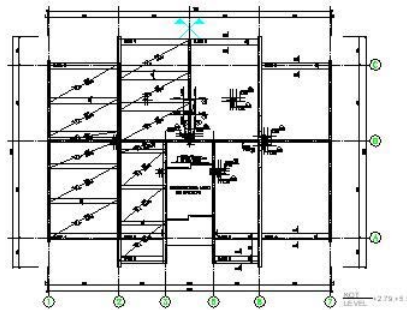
Drawing for the Reinforcement Detailing of a Typical Floor
